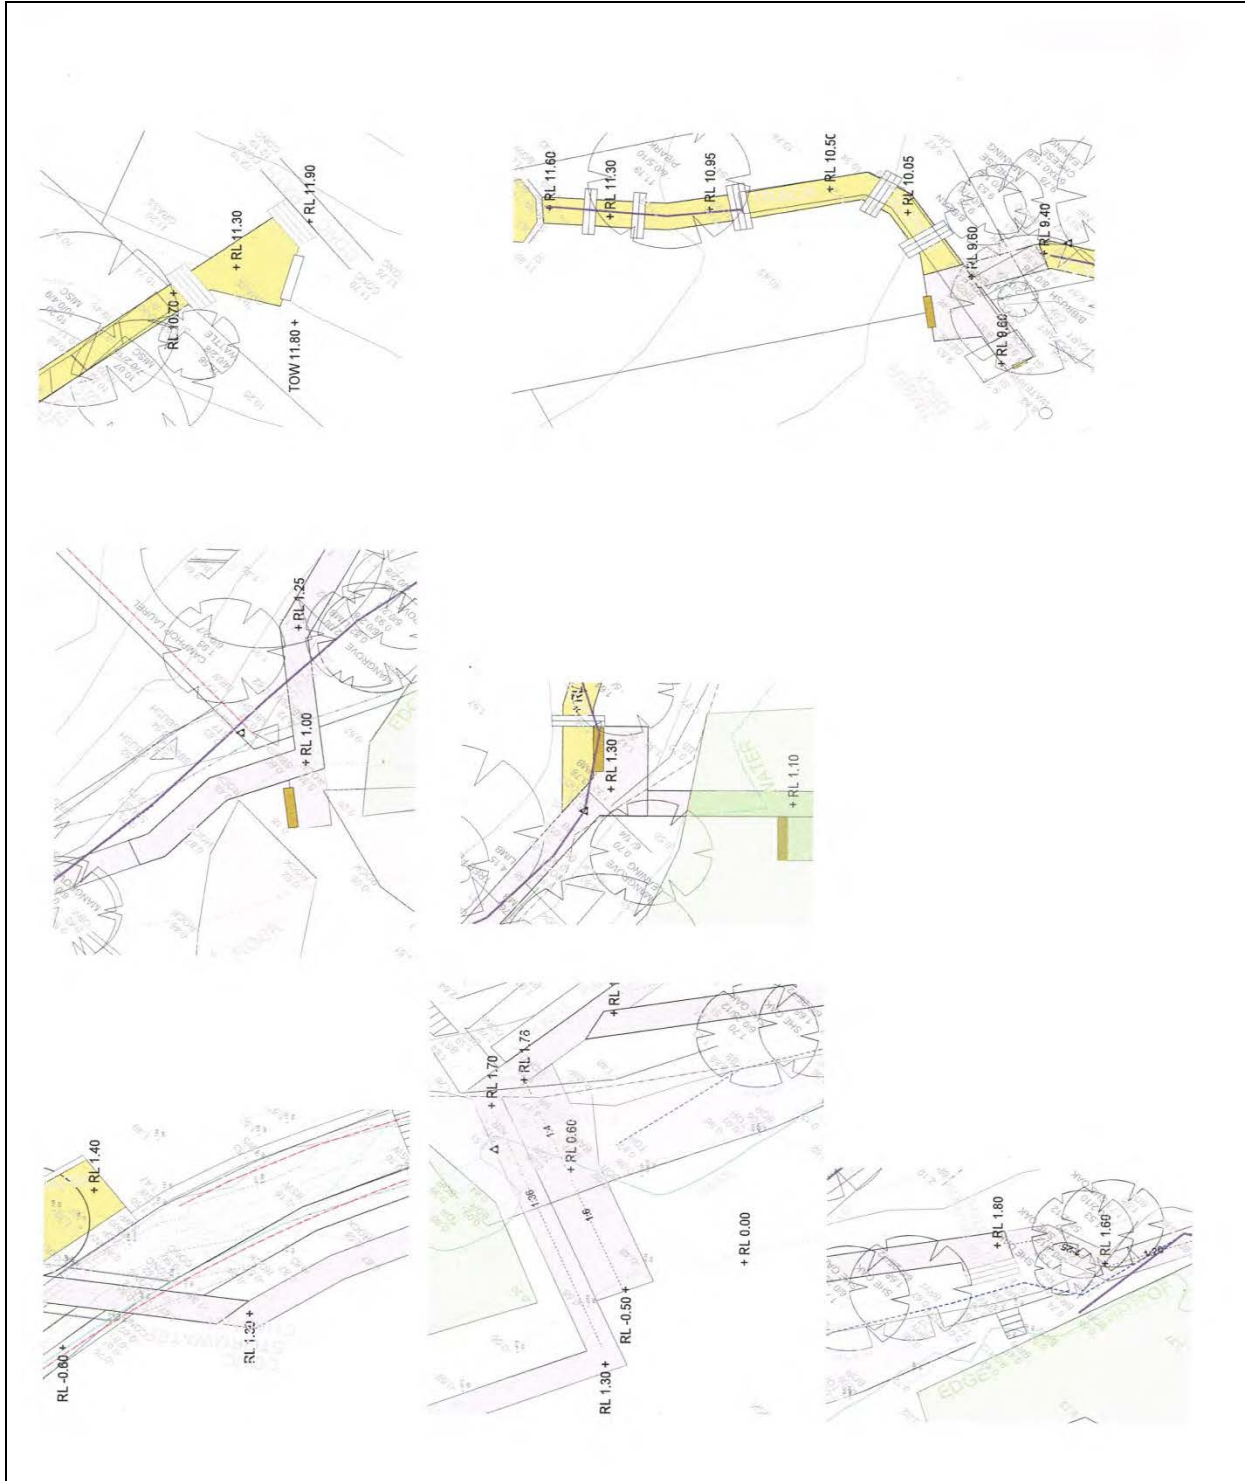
Ryde Riverwalk Landscape Master Plan – Detail Design at Ross Street.
